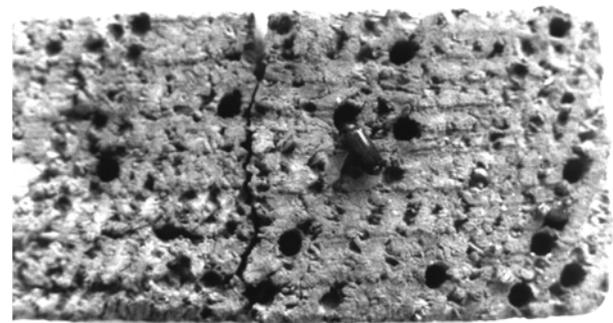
Hide beetle (*Dermestes ater*) damage to a Douglas fir roofing member
